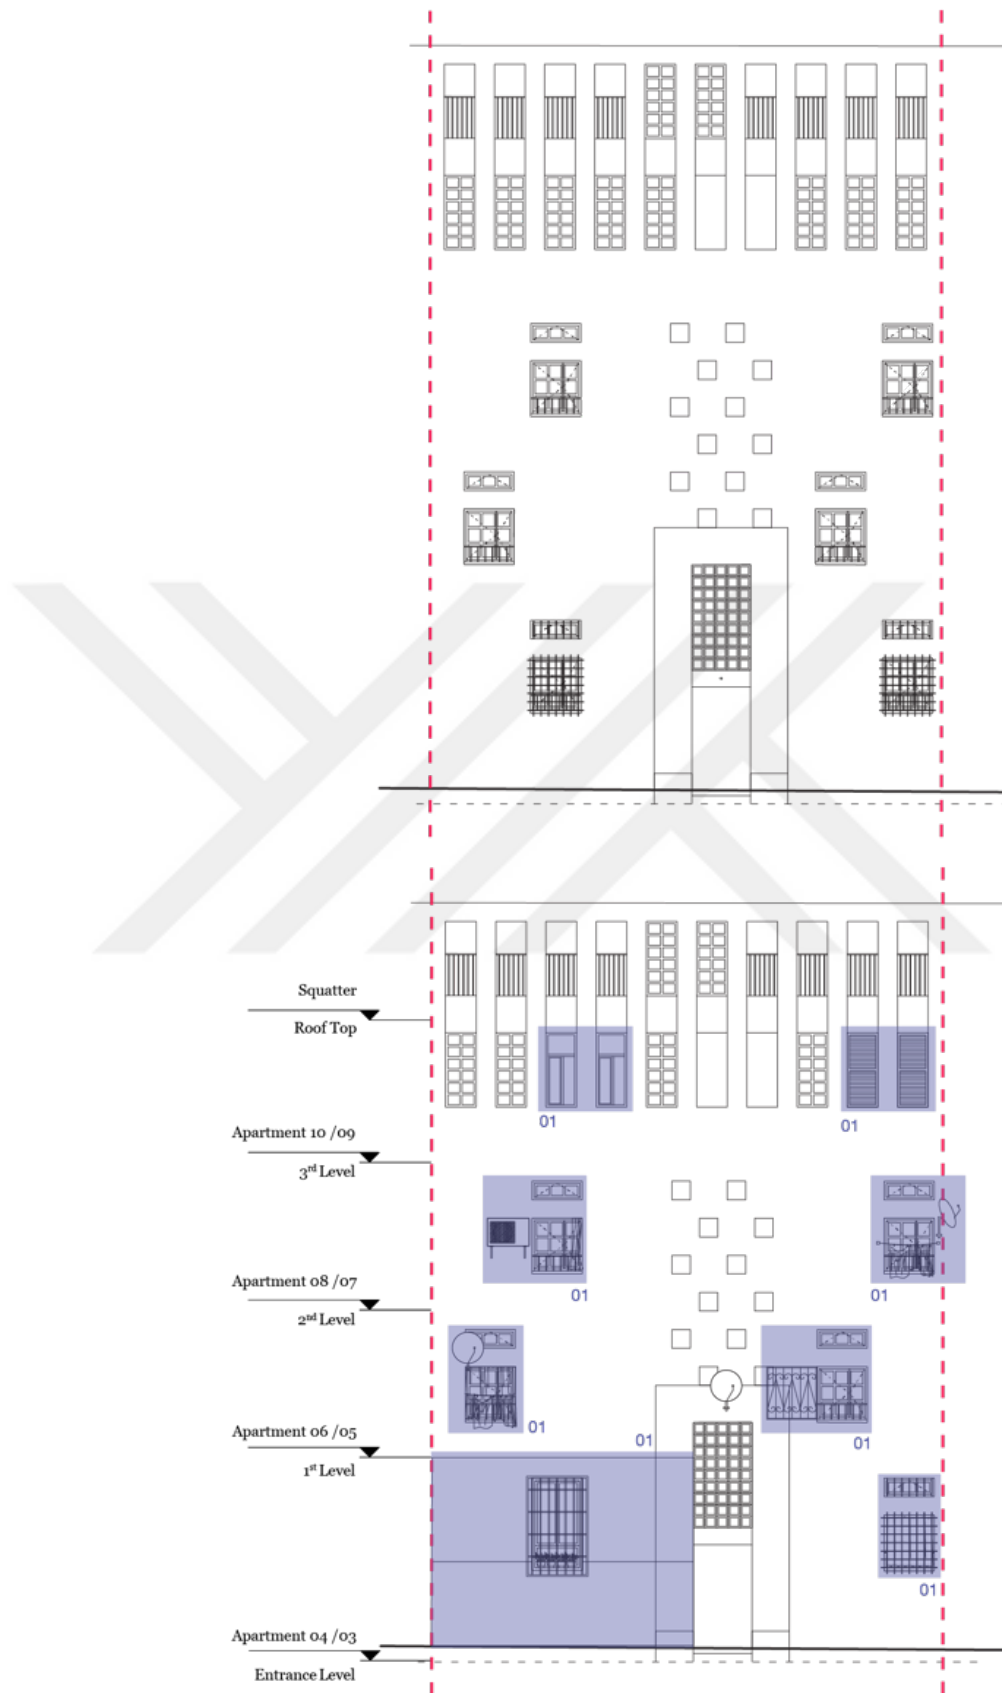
Original (top) and modified (bottom) façade drawings of Block 18. Residents modifications are highlighted on the modified façade (bottom).
